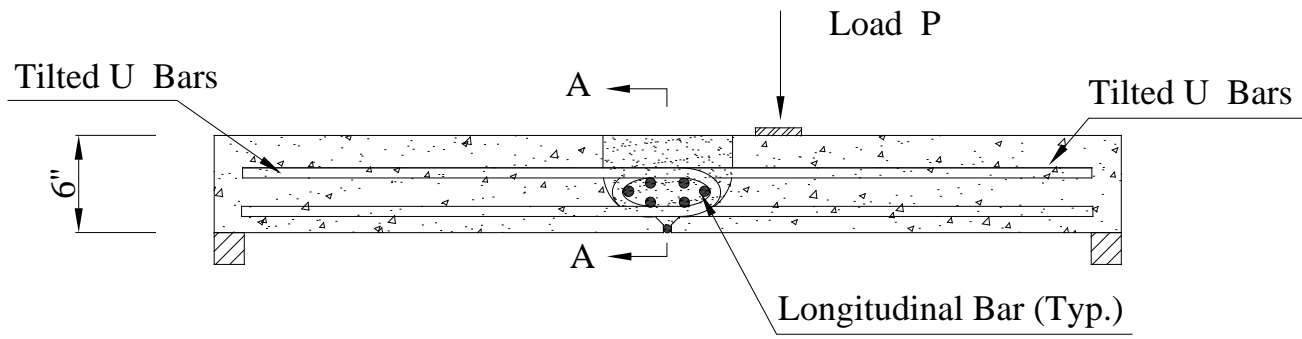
Wide Beam Test – Tilted U-Bar Detail
